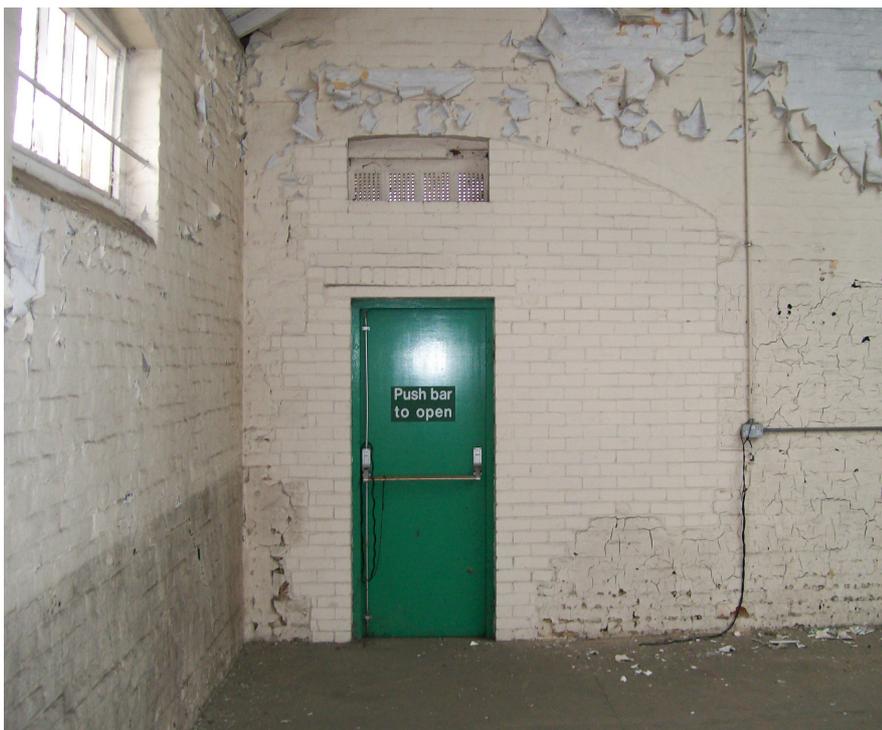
Building 5; the bricked-in archway of the original entrance with modern fire door where the opening would have been.
